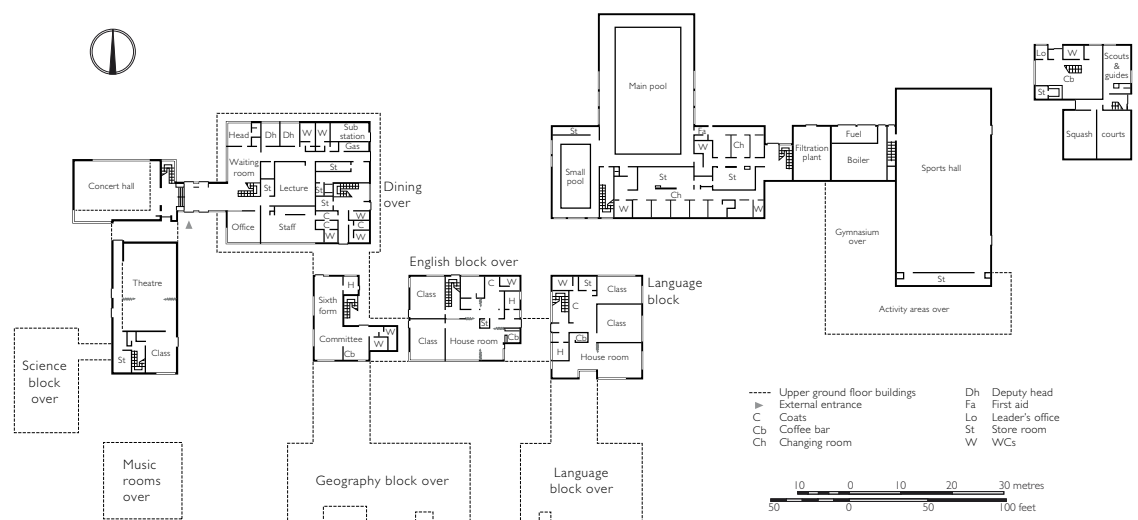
Lower ground floor plan of Toot Hill School, Bingham.
